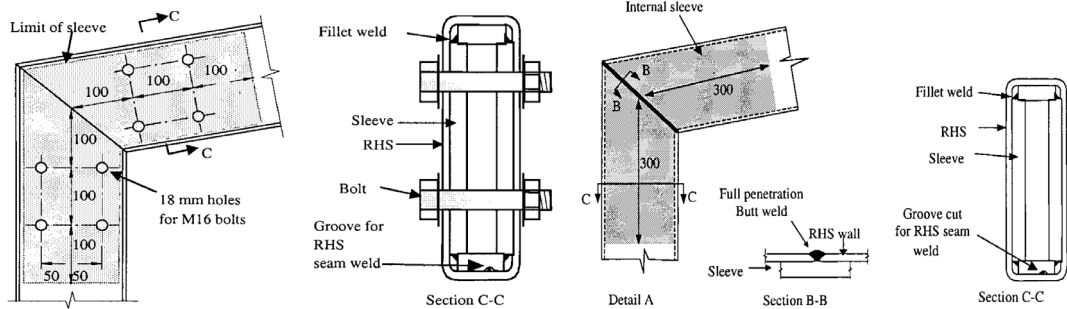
Details of the welded joints considered for the test after Wilkinson and Hancock (2000)
